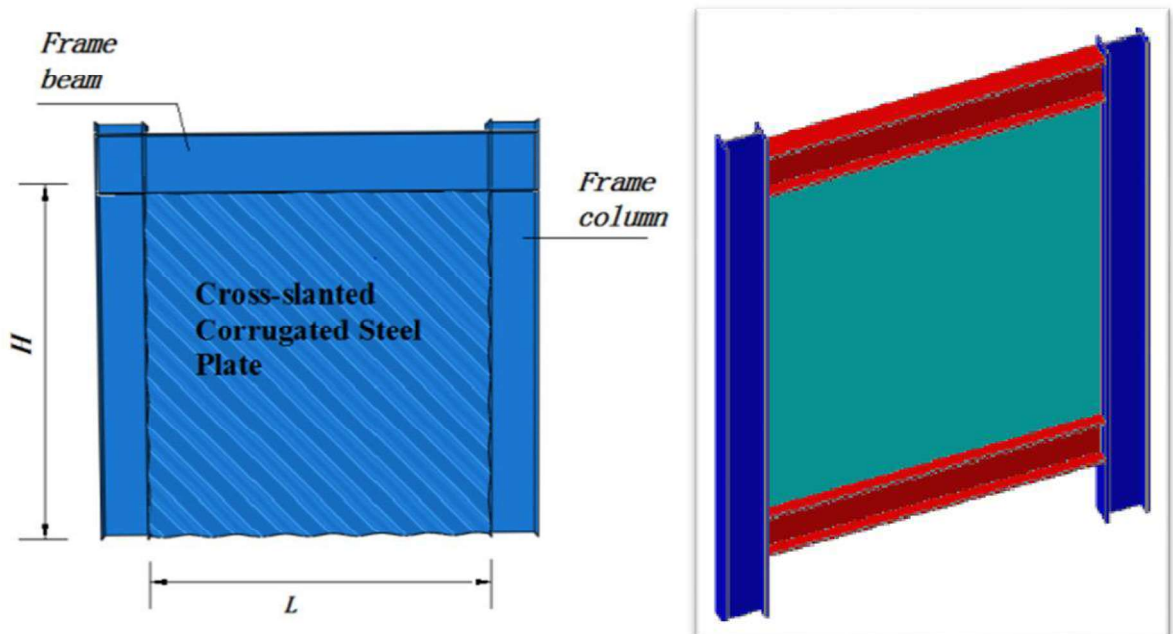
Steel plate shear wall surrounded by steel frame (Jing et al., 2018)
